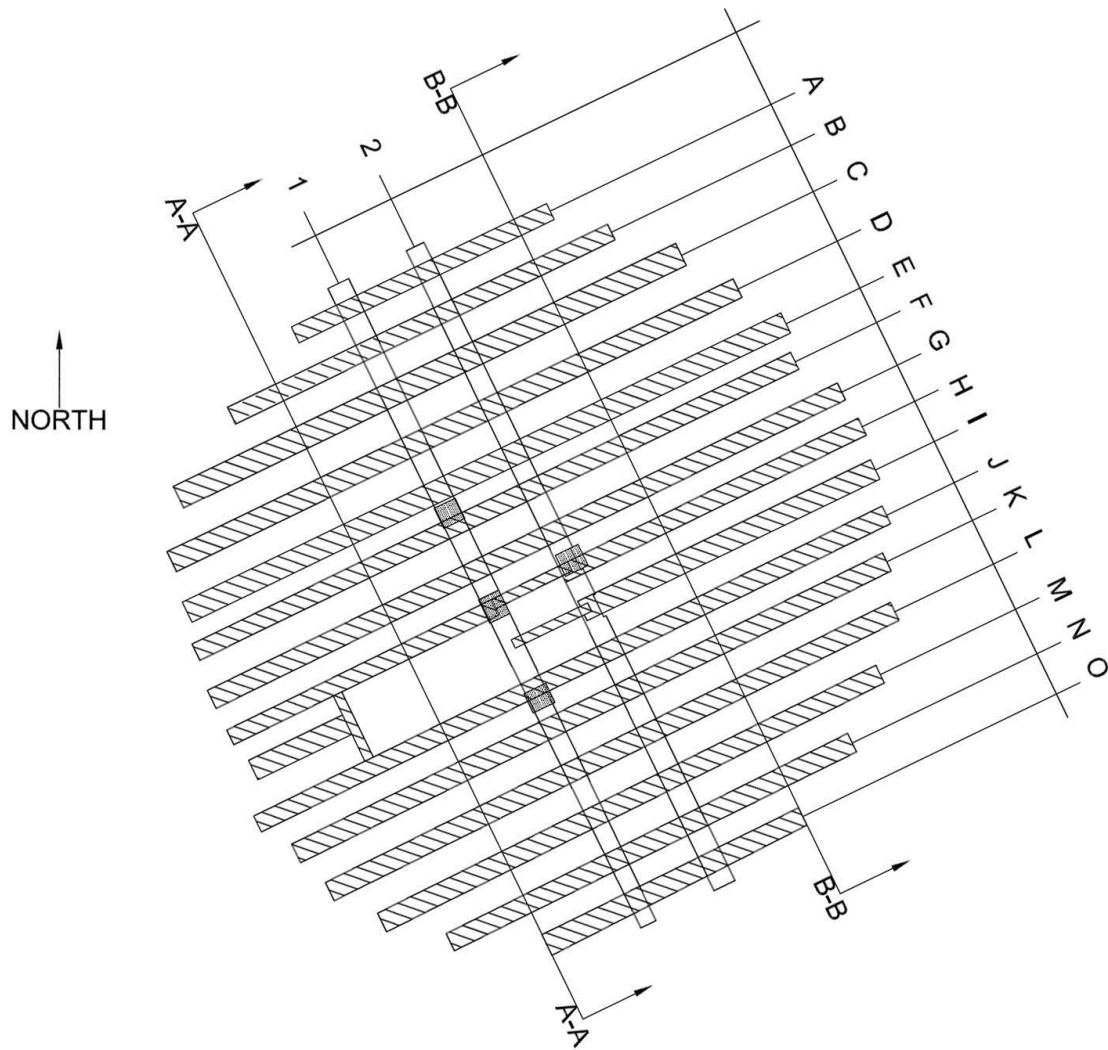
Established plane drawing of second artillery floor (upper floor) with named primary beams (1-2) and secondary beams (A-O).
